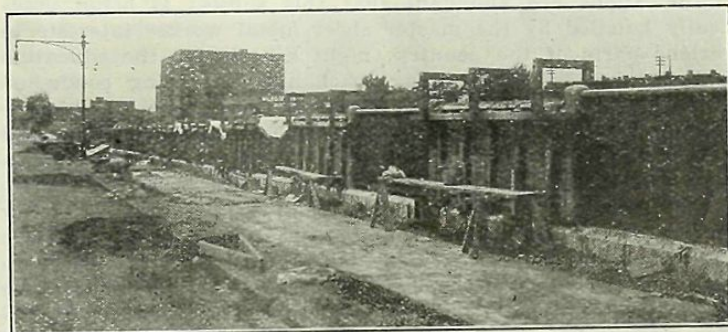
SHOWING METHOD OF CONSTRUCTION FOR LONG ISLAND RAILROAD.
